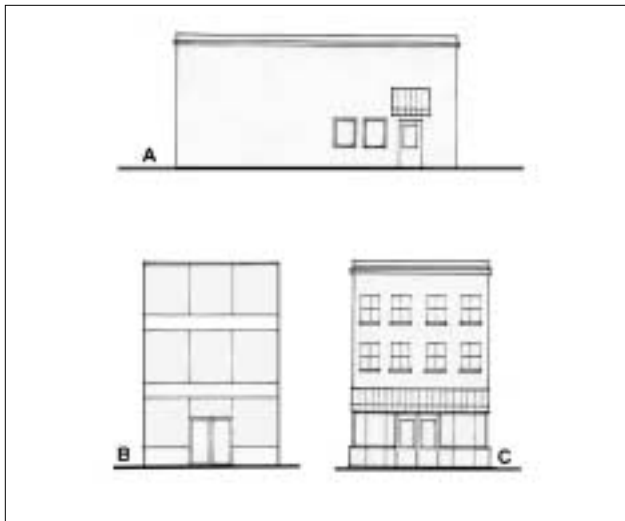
A. The doors and windows are unimportant features in this facade and are uninviting features to pedestrians. B. Although this facade offers visibility, the overall design is not animated or interesting. C. The repetition of windows and the balanced design of this facade is pleasing and attractive.
